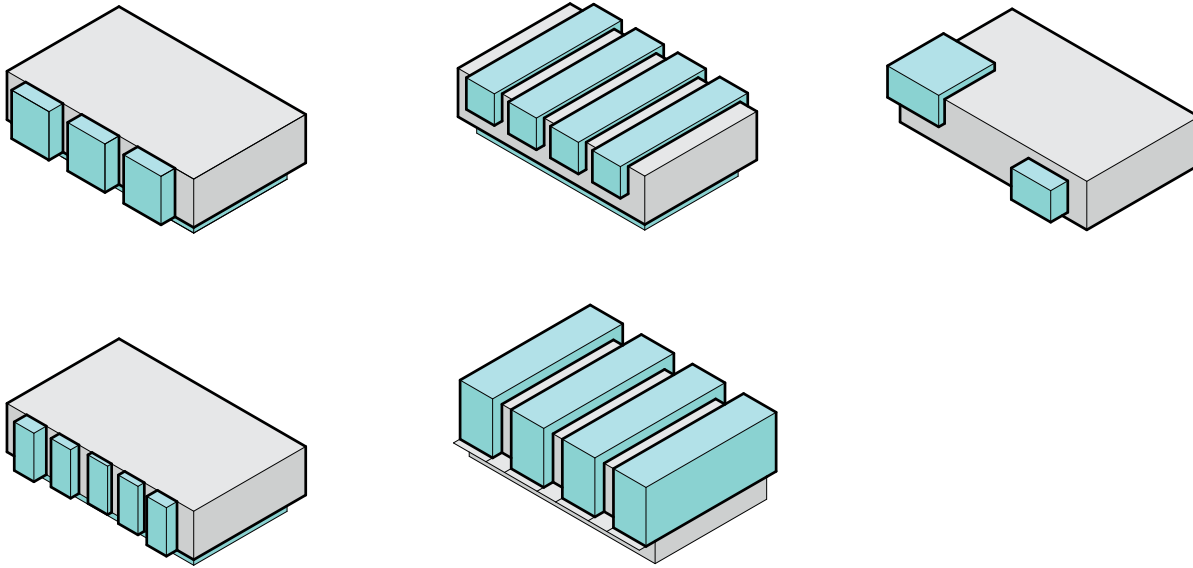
Illustrative Façade Massing and Articulation. Façade projections create rhythm and variety across the facade and accent vertical units.
